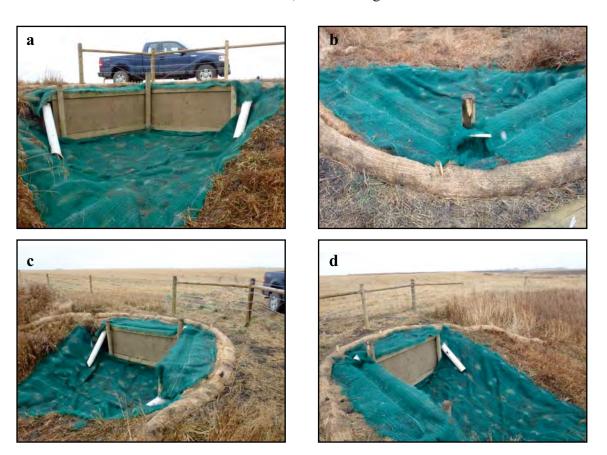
Retaining wall constructed in 2010 at the south end of the North Manure Field showing (a) front view facing north, (b) top view facing south, (c) side view facing west, and (d) side view facing east.
